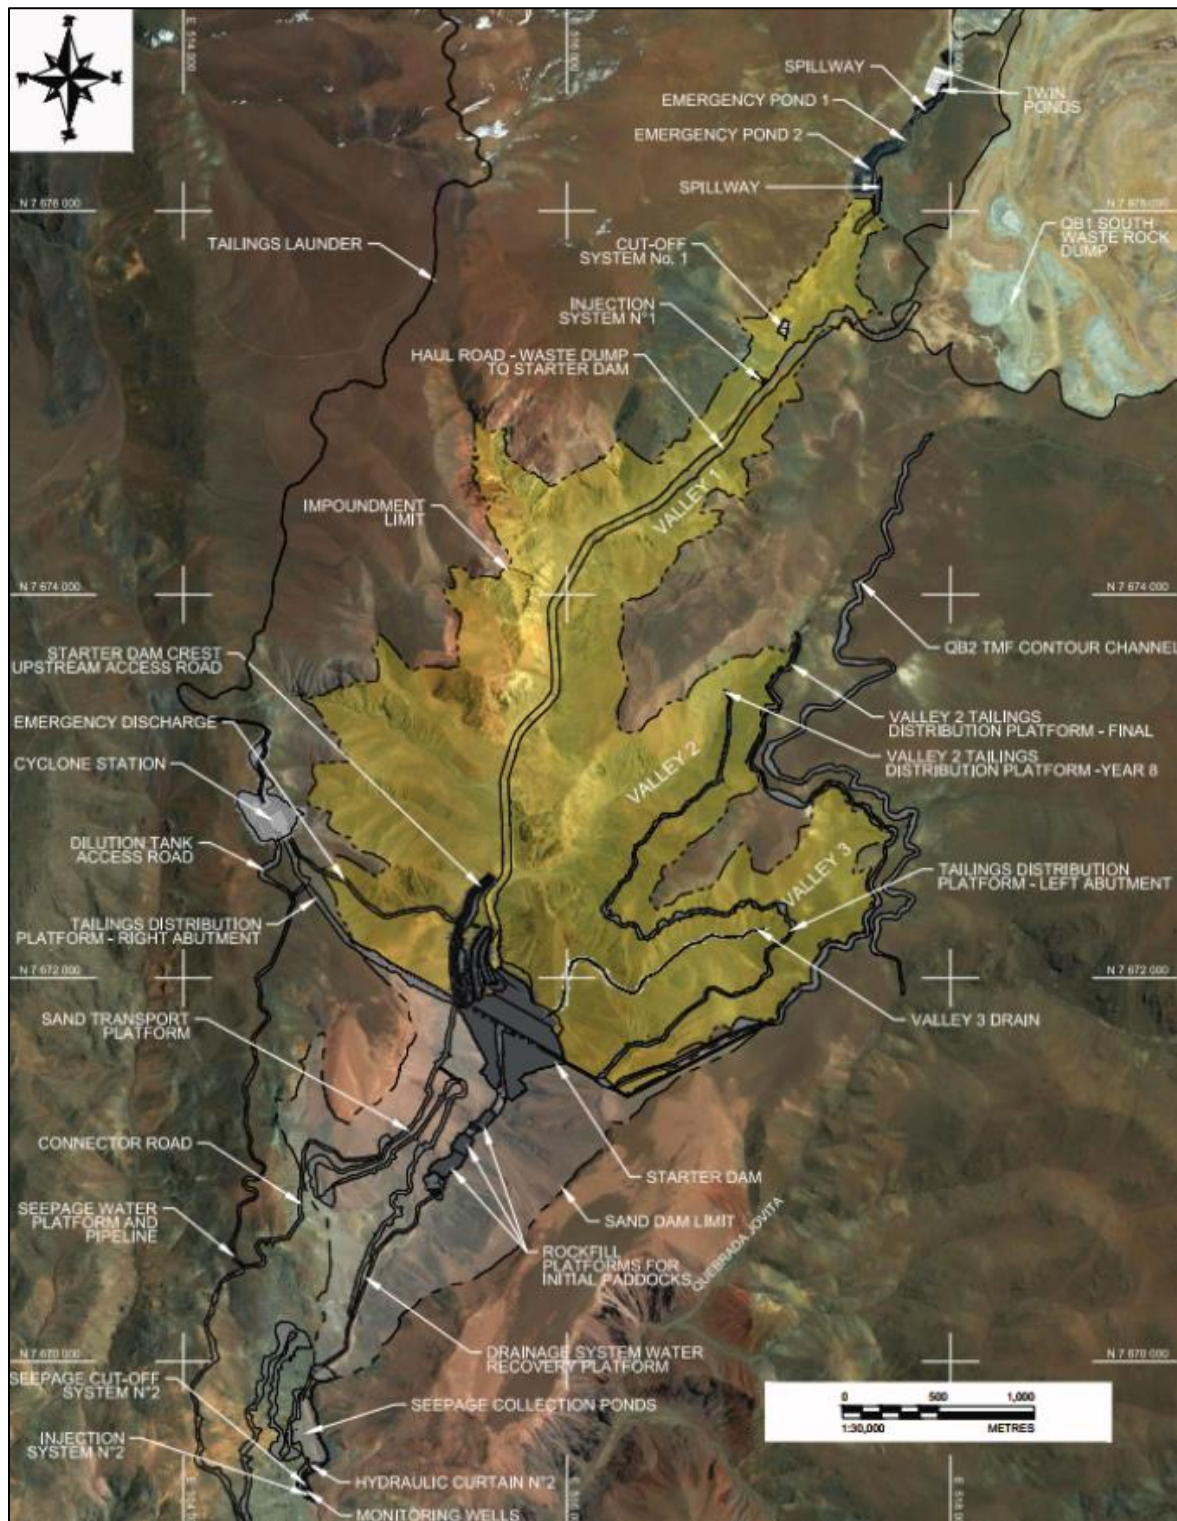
Quebrada Blanca Phase 2 TSF Site Plan
